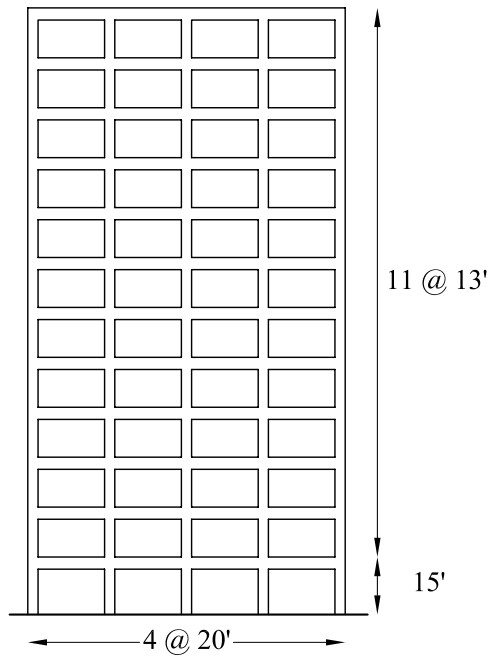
Elevation of the 12-Story Moment-Resisting-Frame
